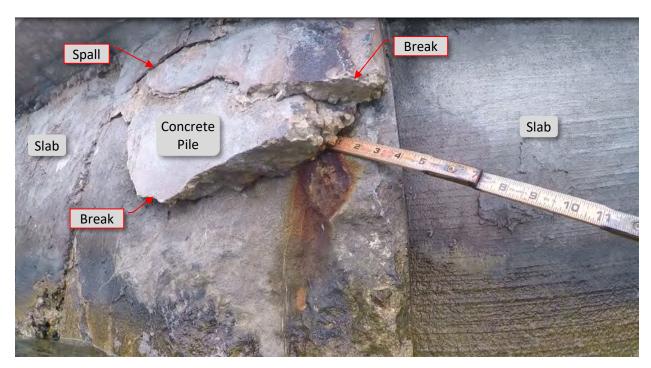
P39. STA 5+72. Cracks/spalls at both flanges at pile with rust staining at east flange, and loss of concrete.
